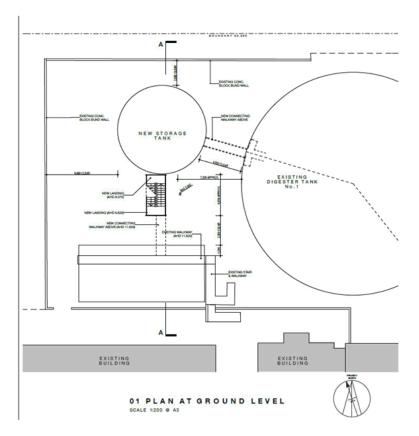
Floor plan of proposed storage tank (Source: James Gatley Architects)
